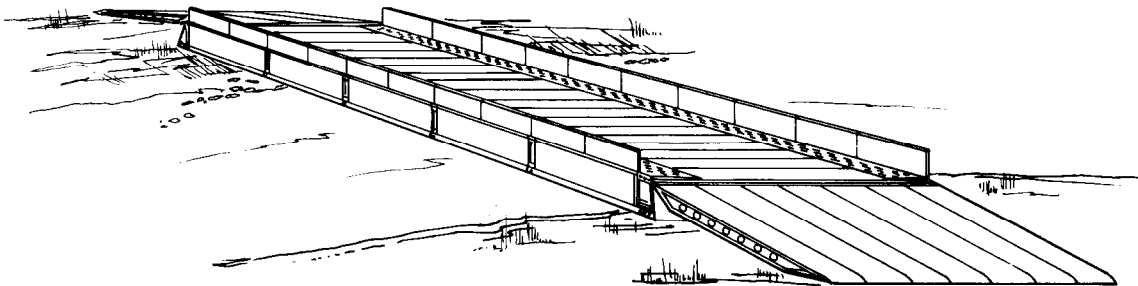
Five-bay, single-story, medium girder (fixed) bridge assembled
